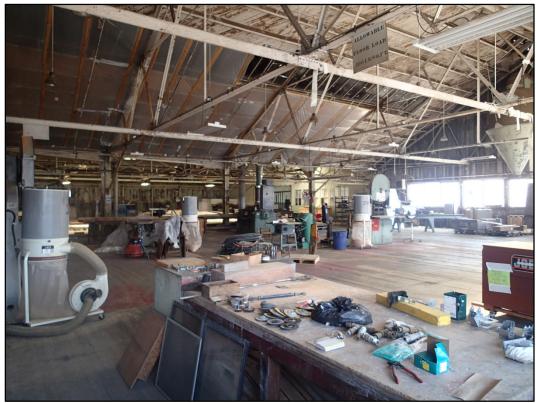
Overall second floor interior view of Building 108, looking southeast.
